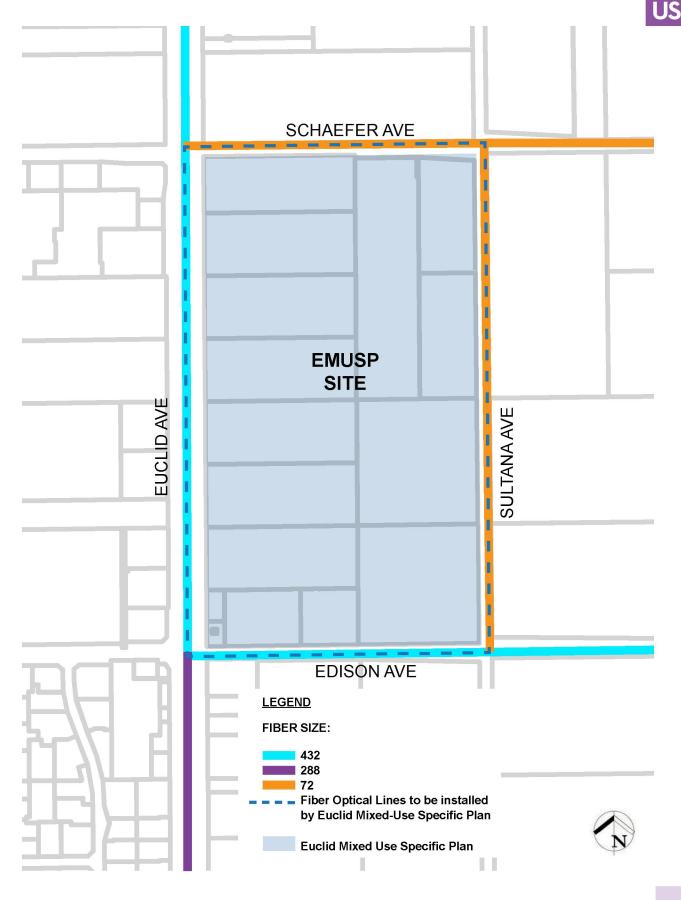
SPECIFIC PLAN FIBER OPTICAL PLAN
